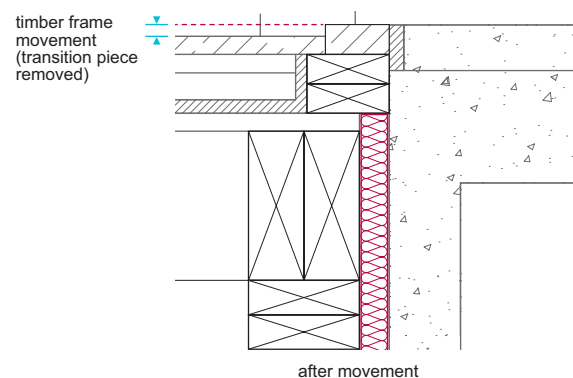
Timber frame interface with concrete or masonry communal areas – after movement
